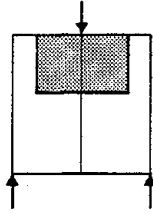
SPECIMEN C - GYPSUM LATH WITHOUT PLASTER
